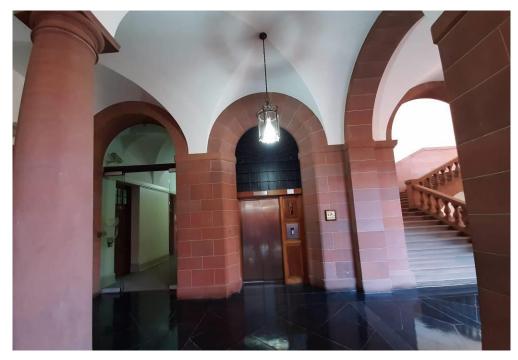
\_Passenger lift replaced on first floor level and wooden cladding put back in place without any damage (Source: tsica heritage consultants, 09.07.2019)
